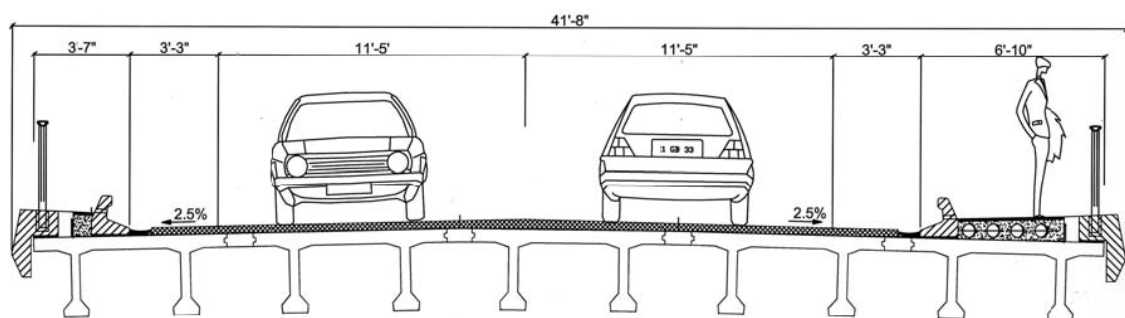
Bourg-lès-Valence bridges - Typical cross-section
